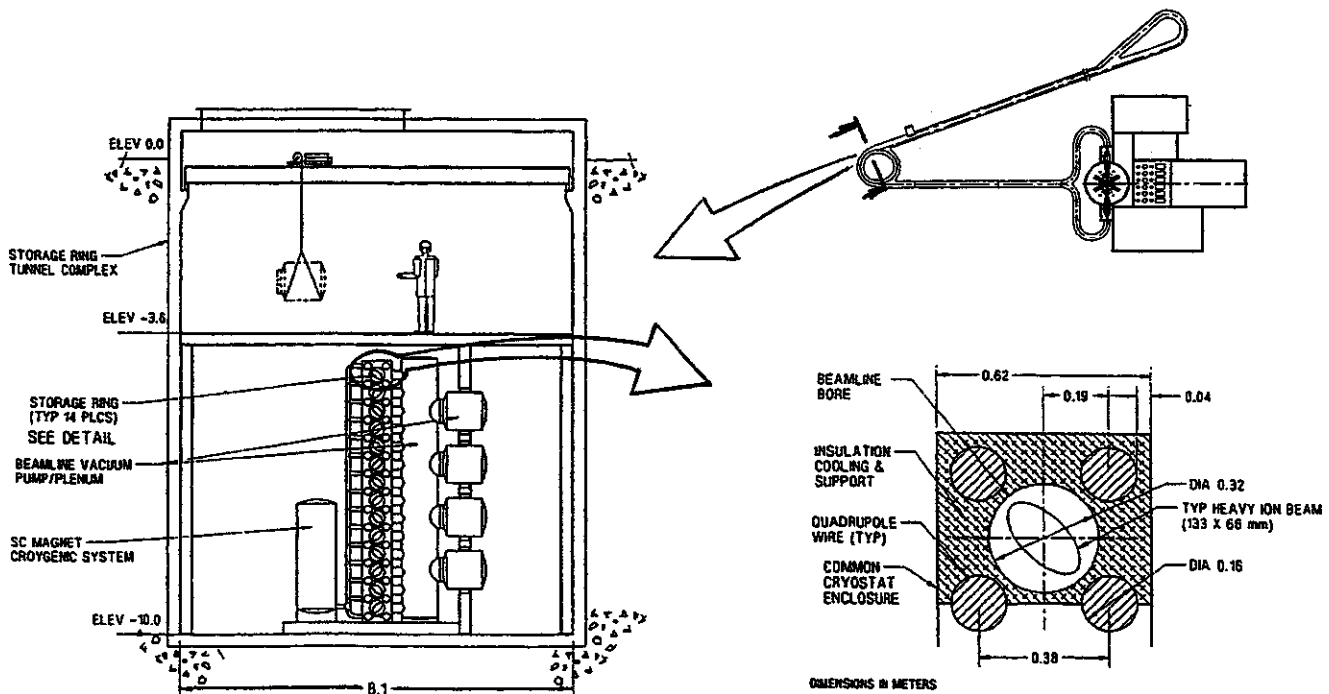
Storage Ring Tunnel Cross-Section and Typical Beam Detail
